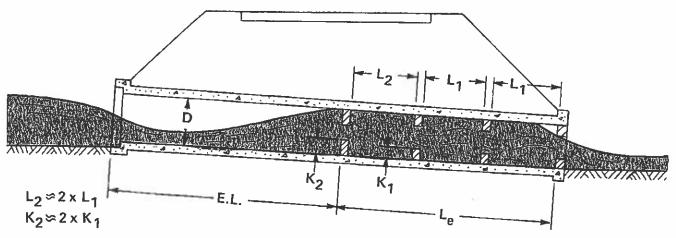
FULL FLOW IN PIPE CULVERT.
